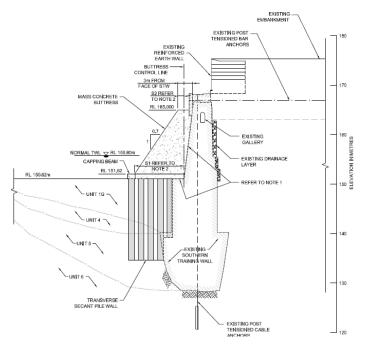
Cross section of STW showing the mass concrete buttress and cellular foundation
